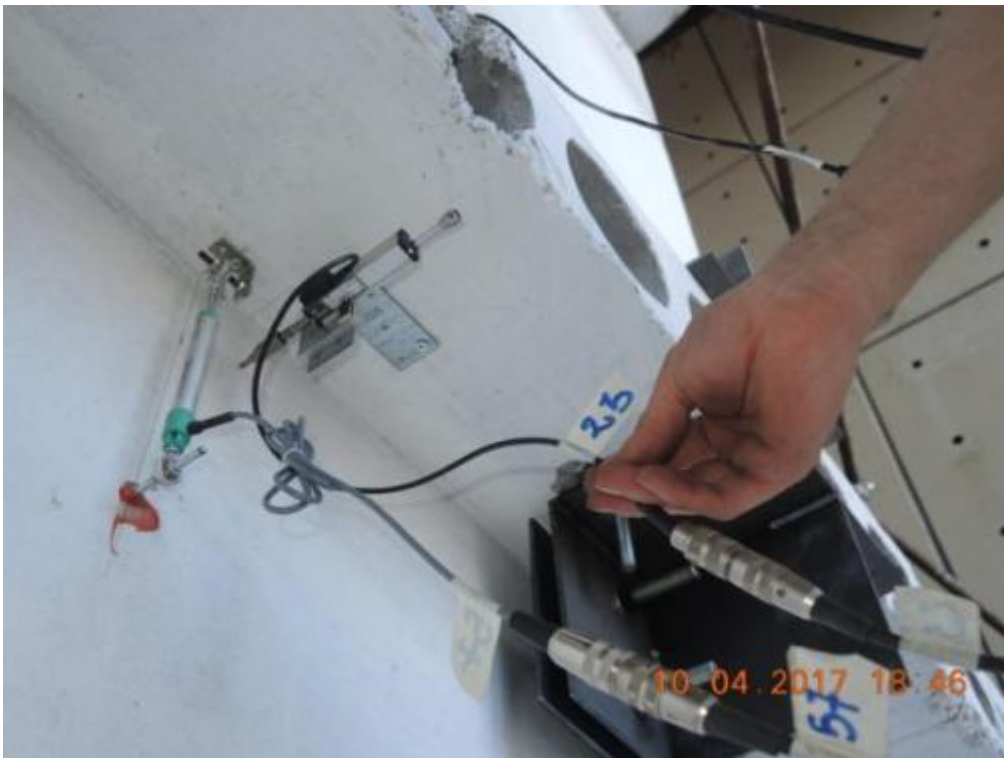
Instrumentation at the top of lateral walls – Opposite side of the specimen.
